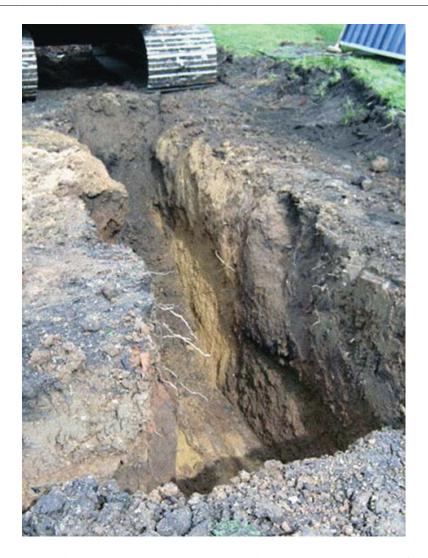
Working shot showing a quarry pit section in the eastern corner of the site.
